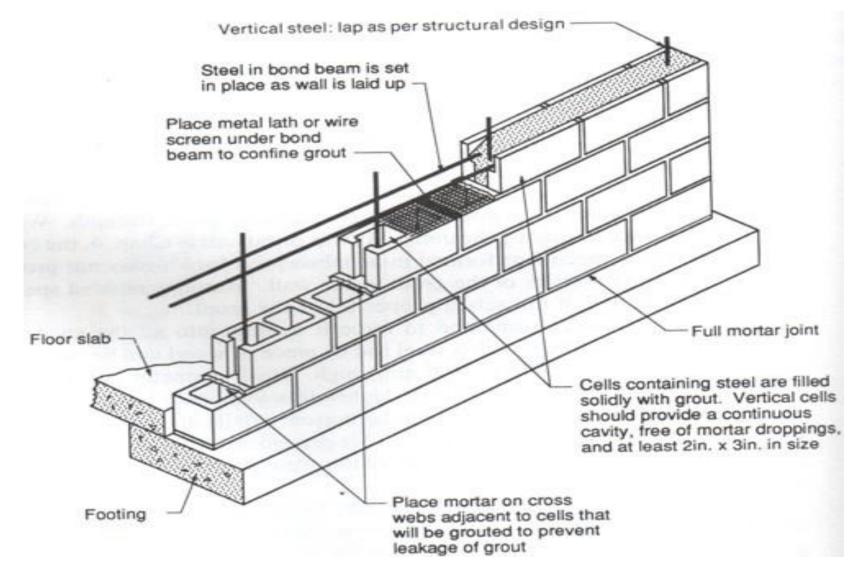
CORRECT SEISMIC MASONRY REBAR PLACEMENT (Credit: Reinforced Masonry Design by Schneider and Dickey)
